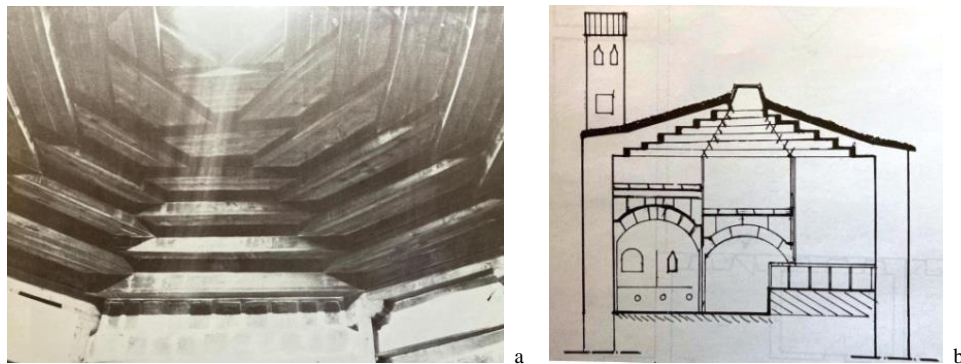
Opening Above the Tandoor in the House of Hacı Kazım Bey in Erzurum and Section
